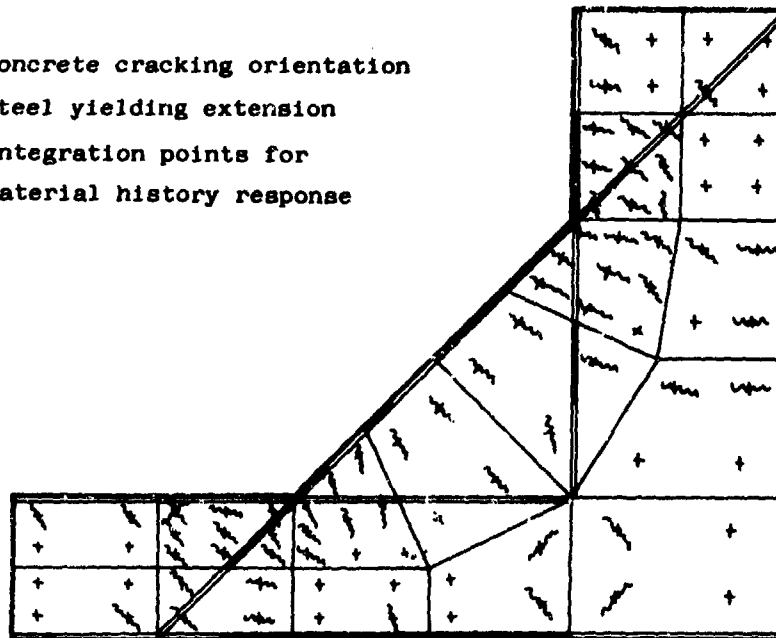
Steel yielding and concrete cracking after 5.75 ms
